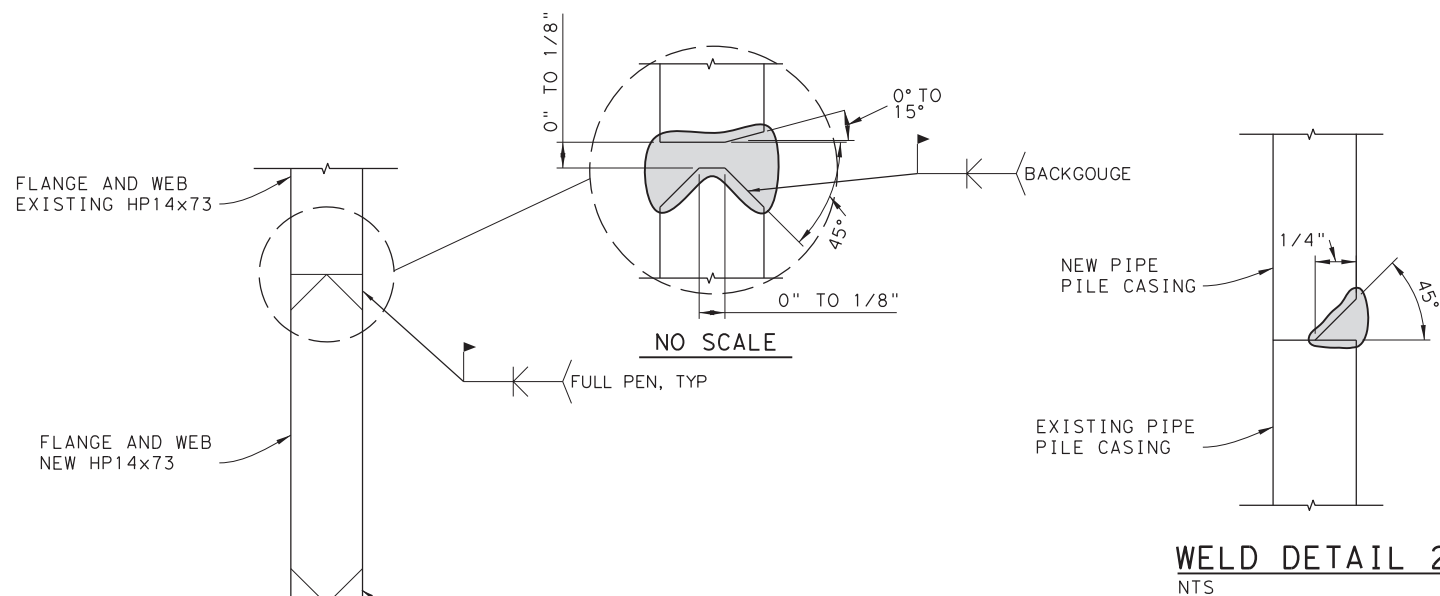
TOWER LEG REPAIR - LANDING #4
